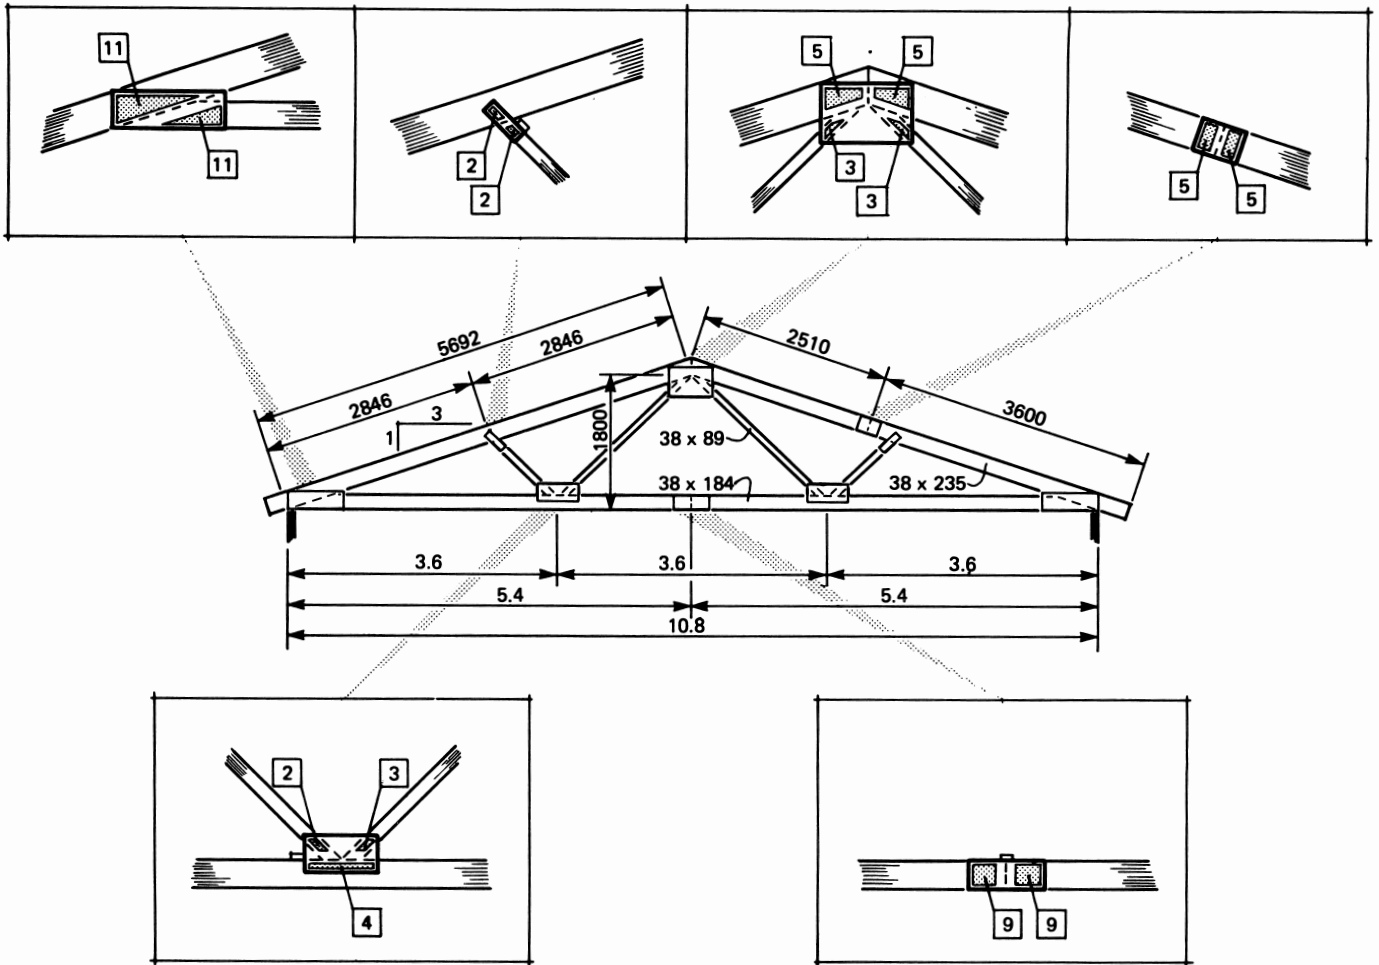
CPS Plan M-9143 – Typical single W, double slope CPS truss.
